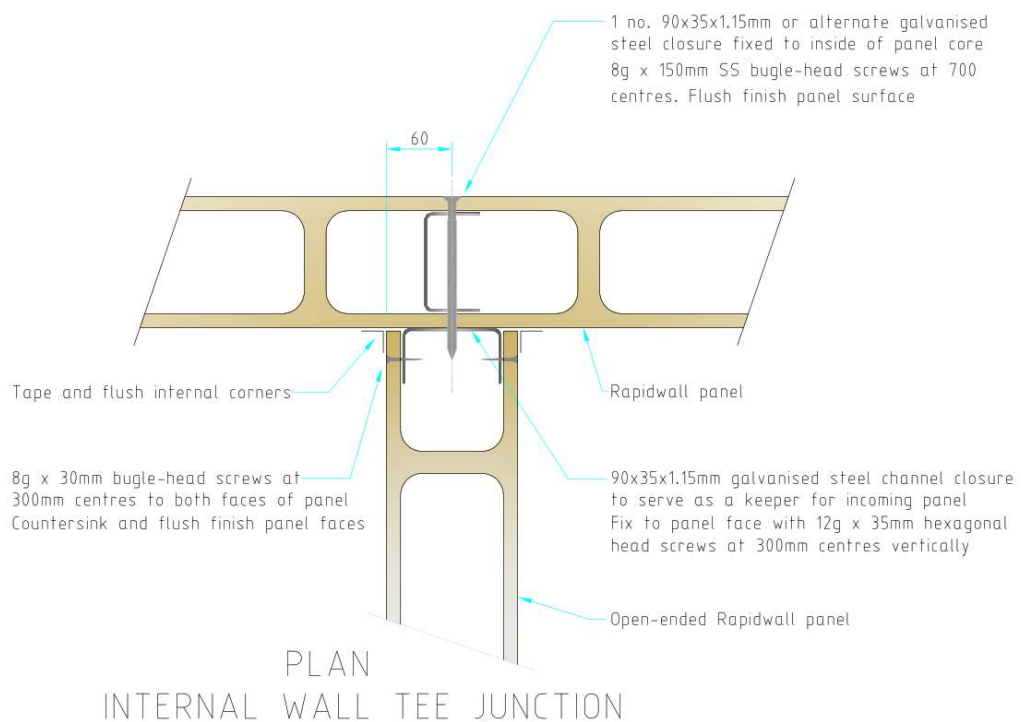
Internal walls 'T' Junction concrete filled or Insulated
